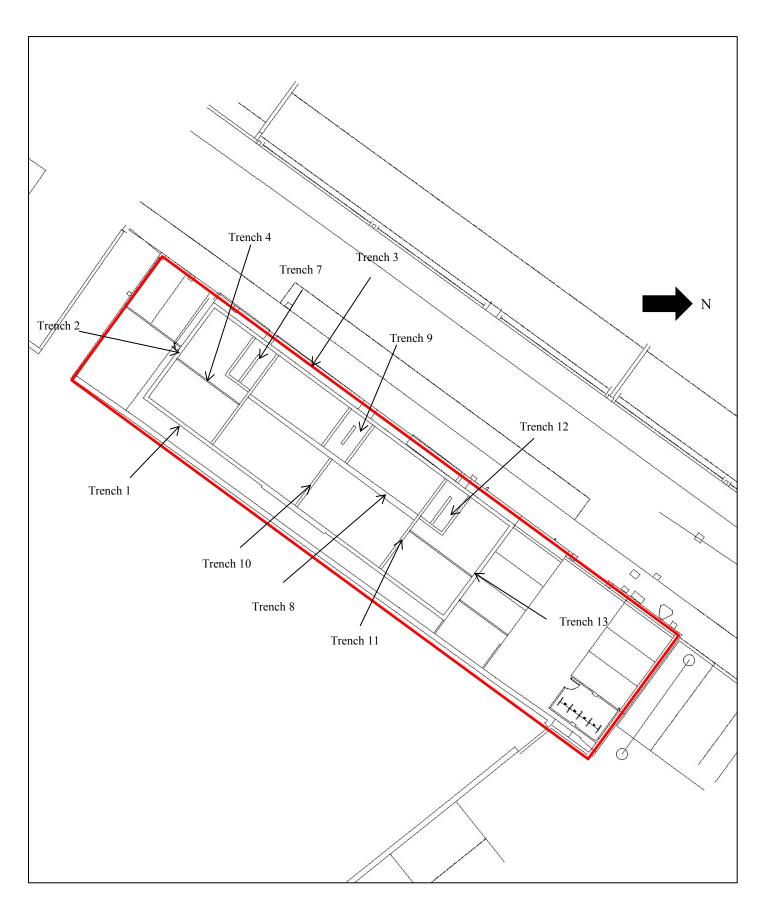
Location of foundation trenches. Scale 1:200 at A4.
